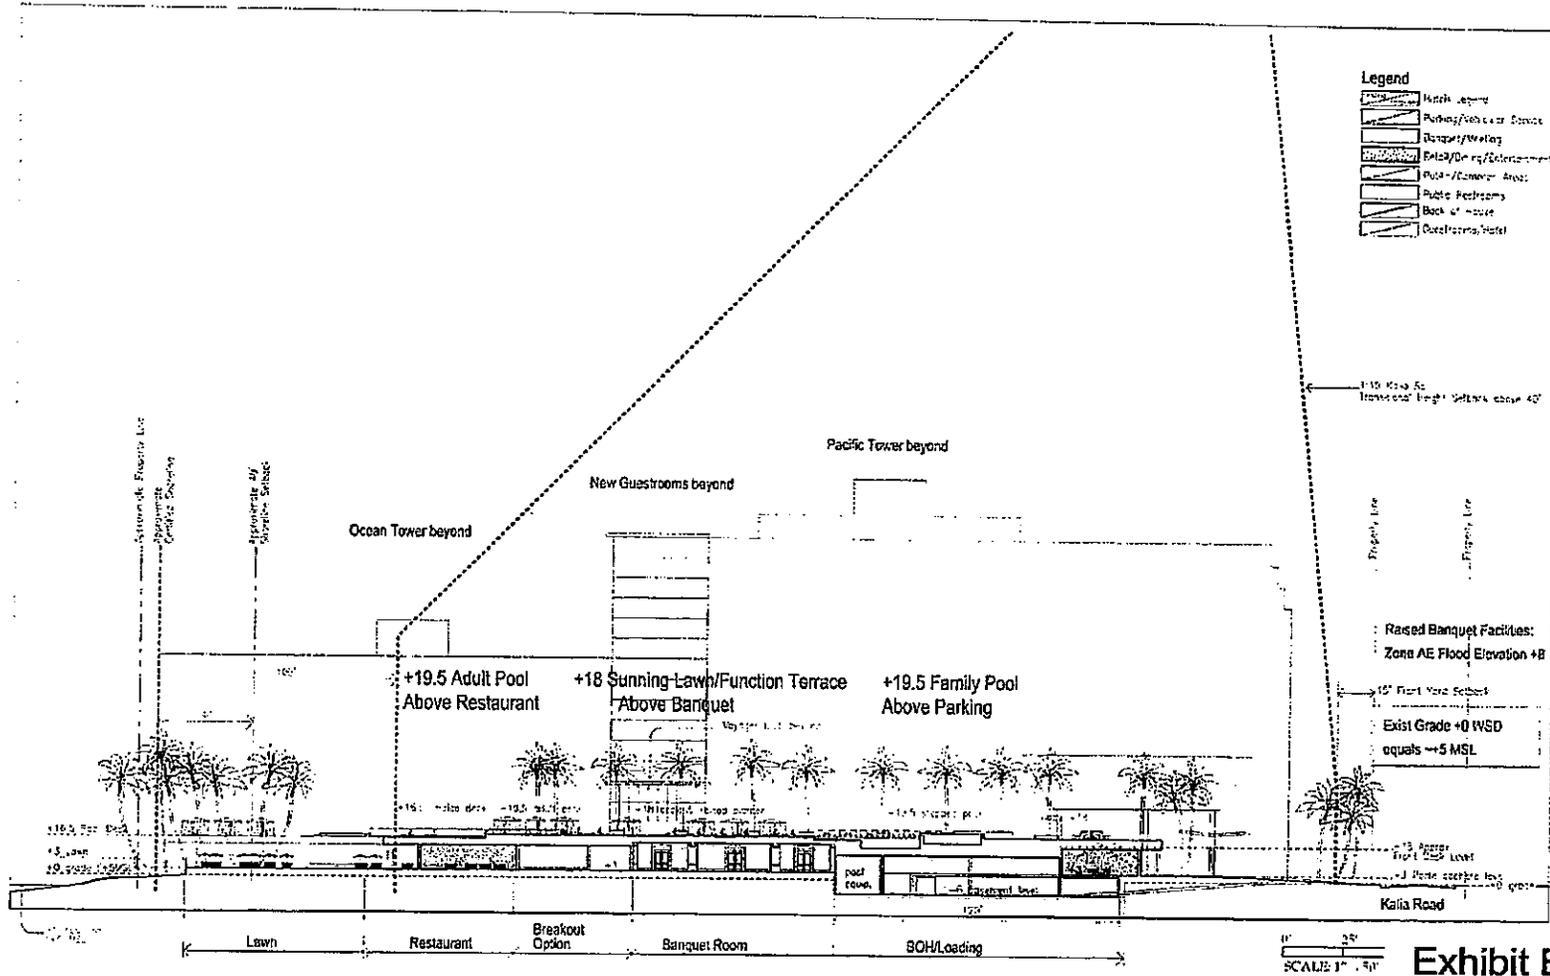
Section 1 (Diamond Head Looking 'Ewa)
